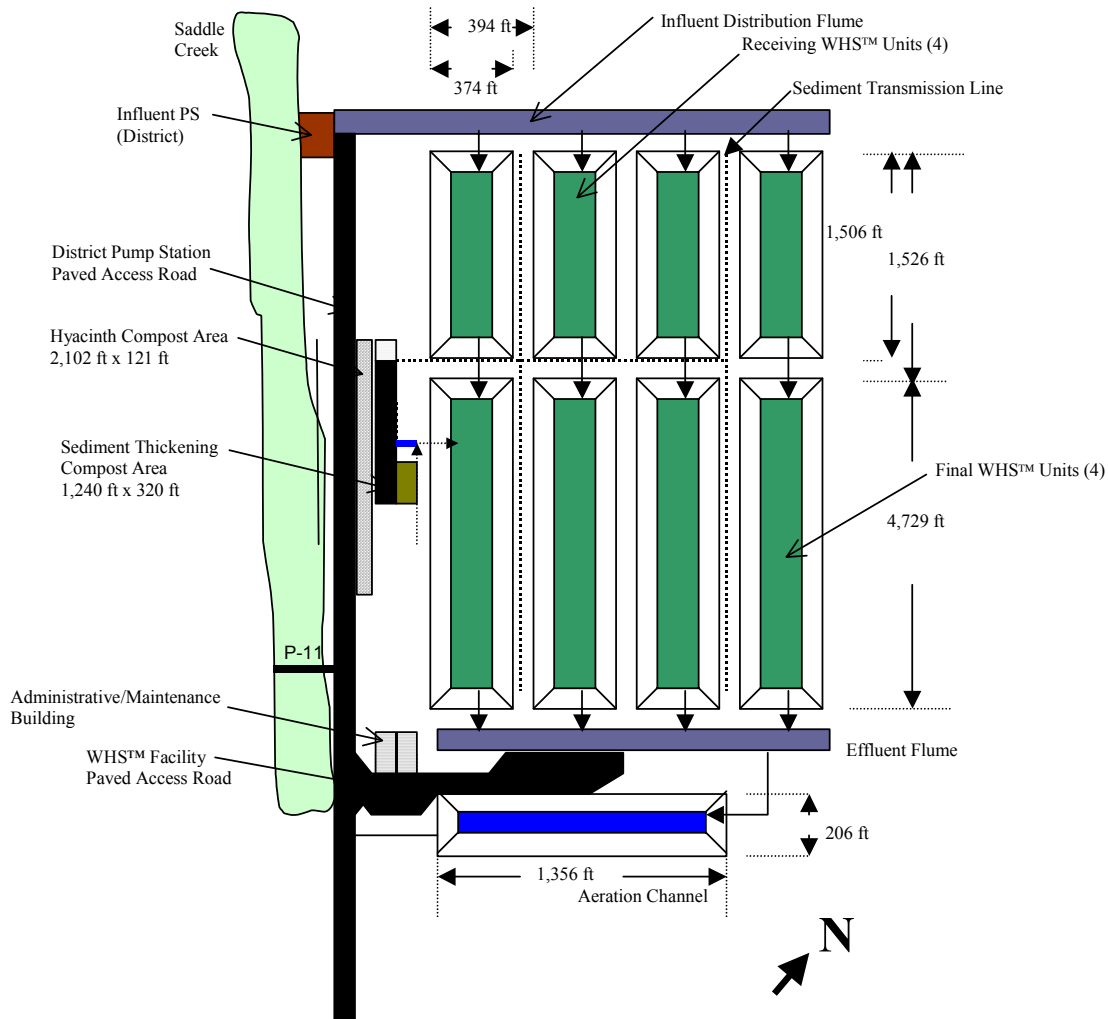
Figure H: General layout proposed Lake Hancock WHS™ Nutrient Recovery Facility: Drawing not to scale (nts)
